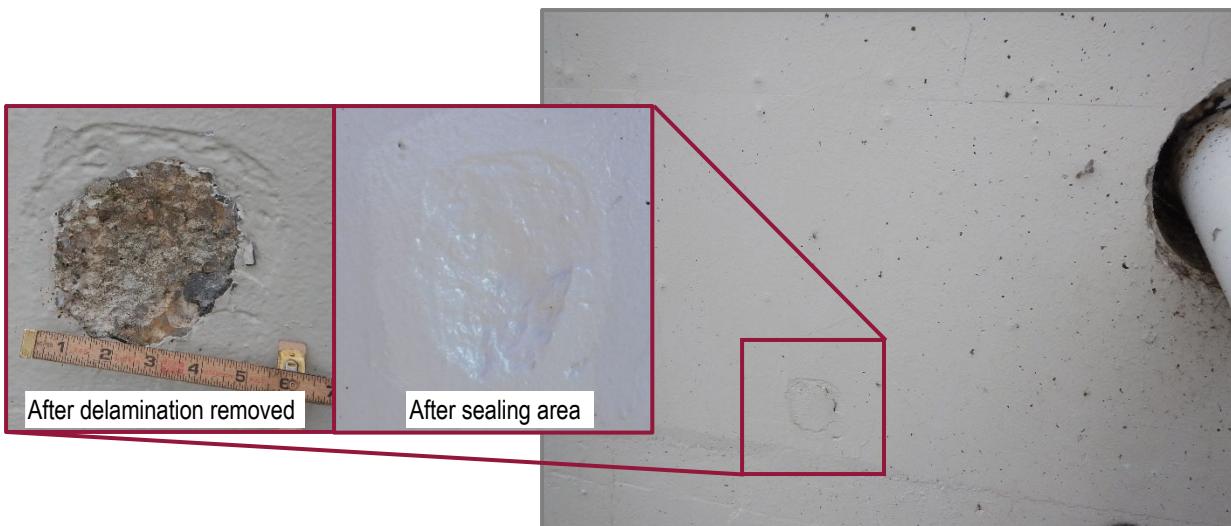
Tower 4 south face in Segment 17 near Cable M30E with a delamination that was removed and sealed (looking north).
